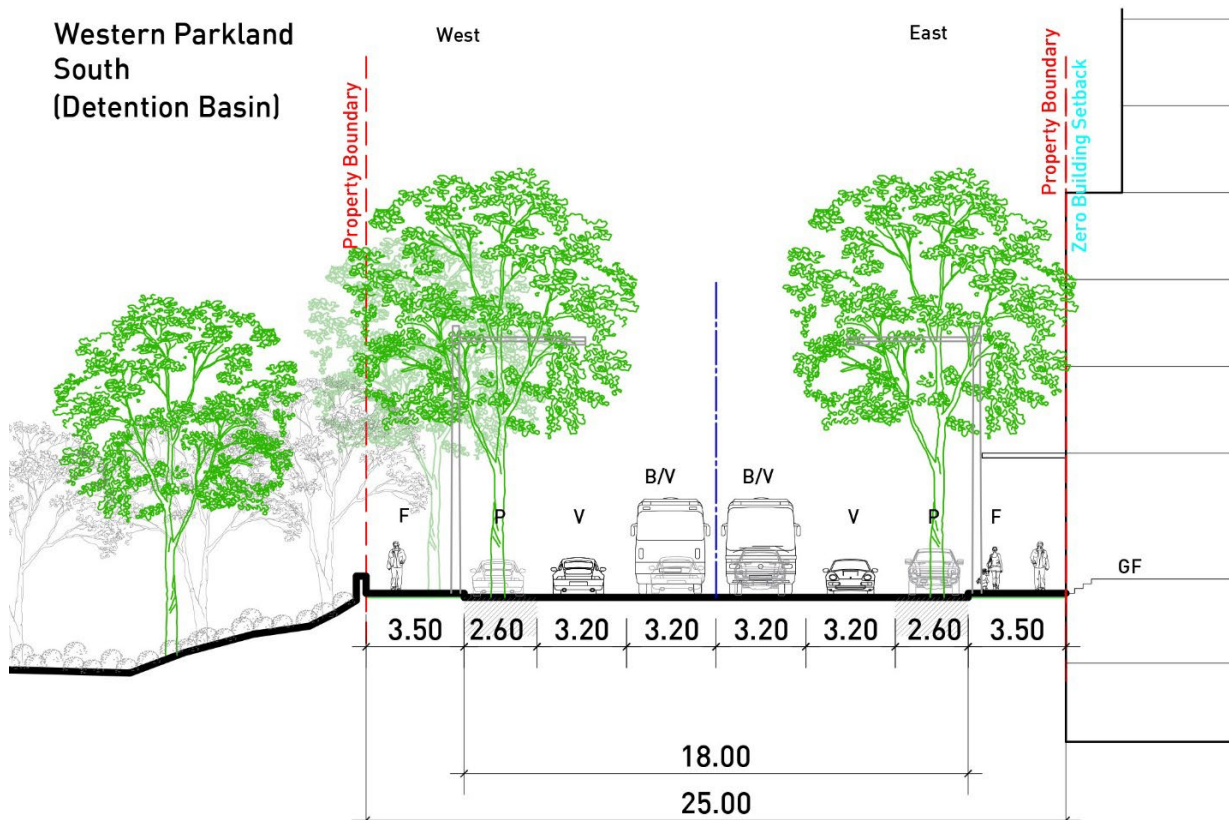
Type 1C Major Road Town Centre and Western Park Interface (NSR 2)
